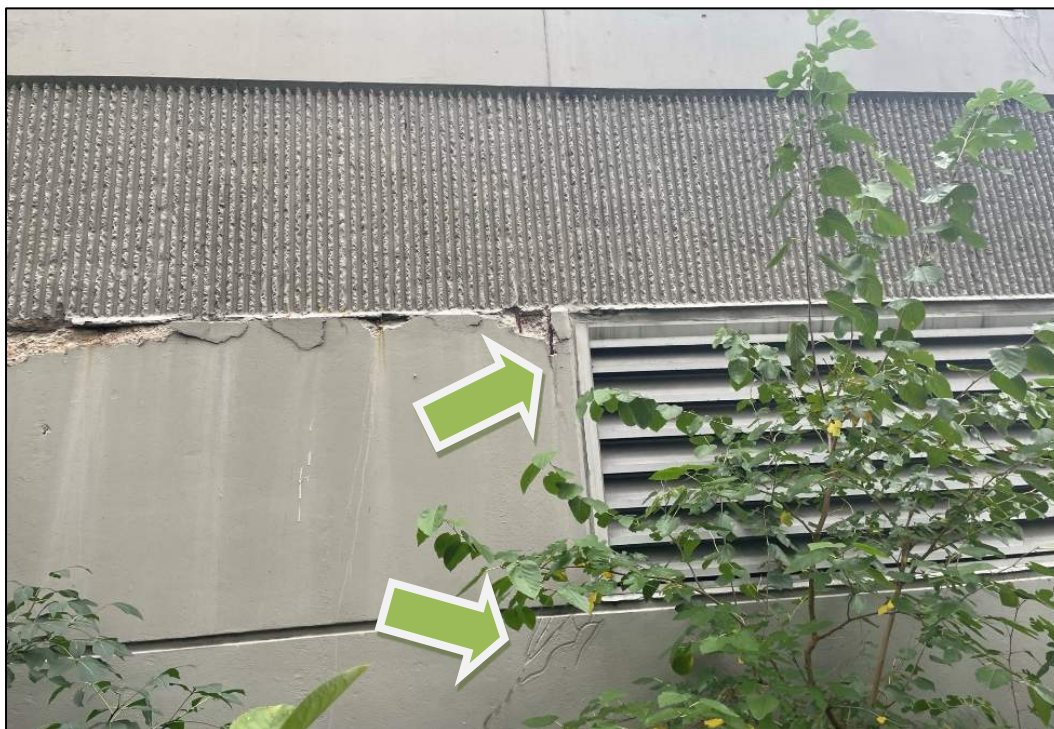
Cracks and spalls continue along the cold joint and travel down the side of a vent louver.
